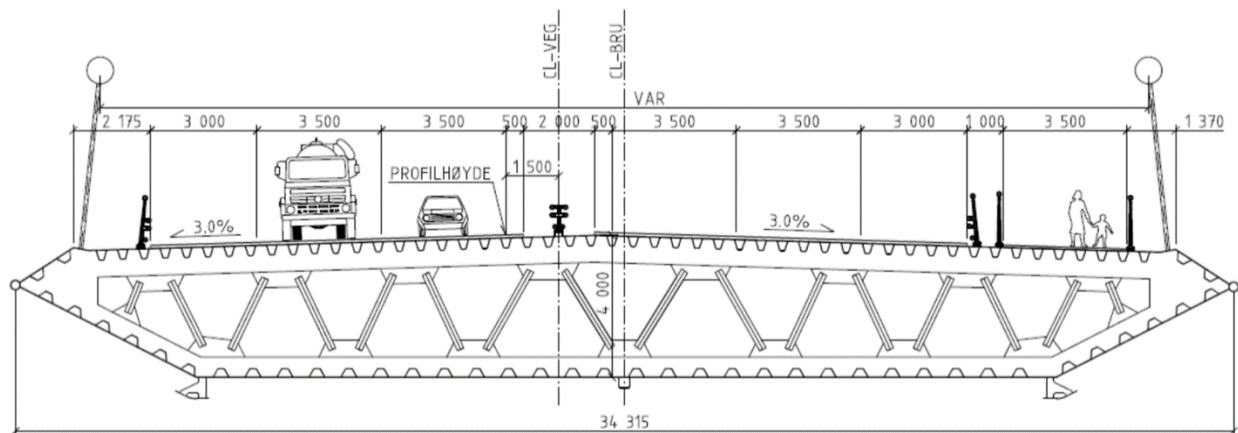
Cross section of the steel bridge girder concept (Norconsult, 2015).
